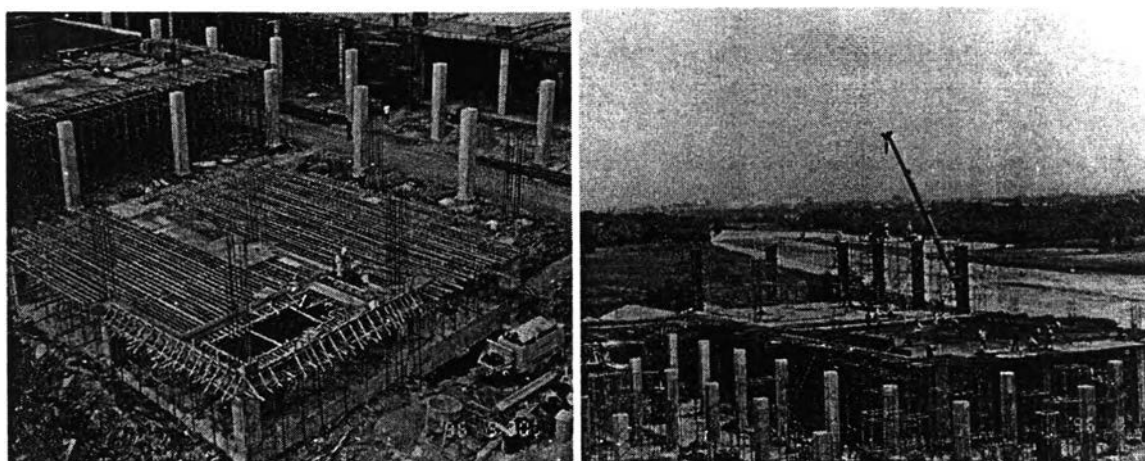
A mobile crane is used to place concrete to RC columns of the second floor.
